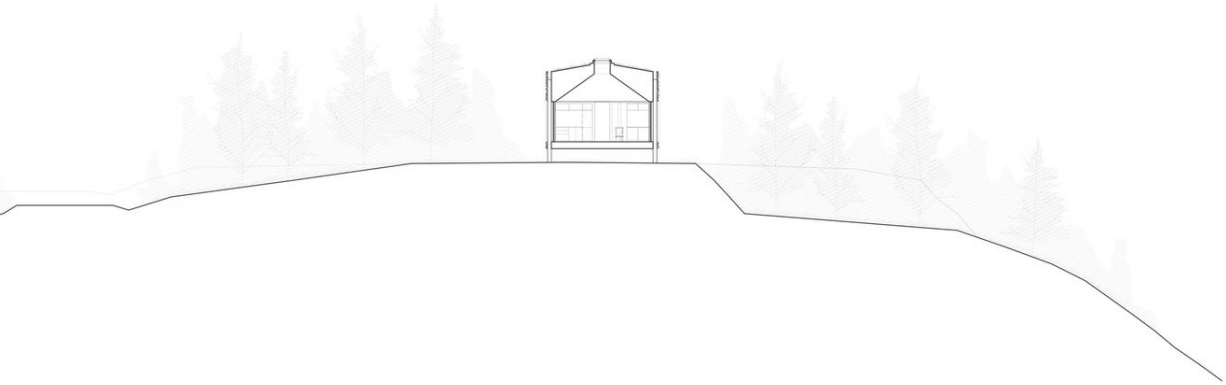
| SITE BUILDING SECTION, PHOTO CREDIT | ARCH DAILY
